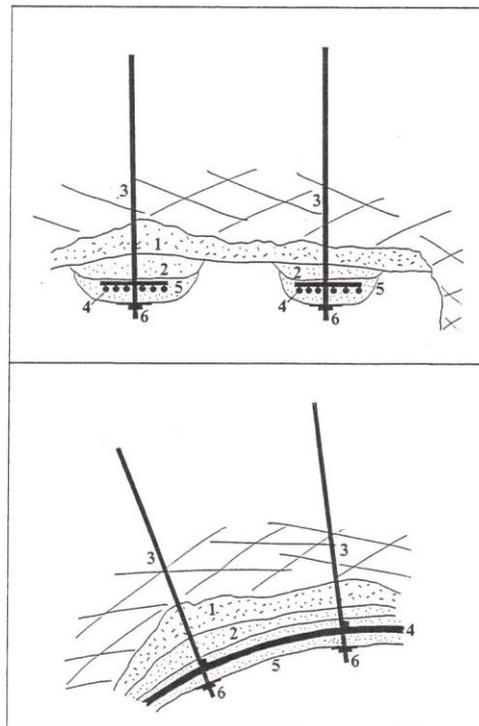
Cross-Section and Longitudinal-Section through RRS Arches.
